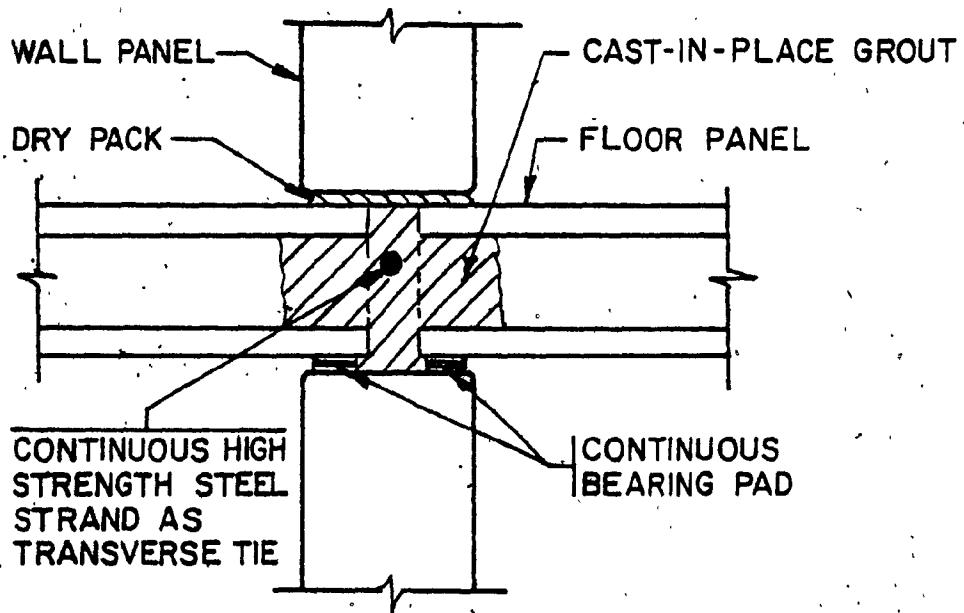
TRANSVERSE TIE ARRANGEMENT, (REF. 2)
